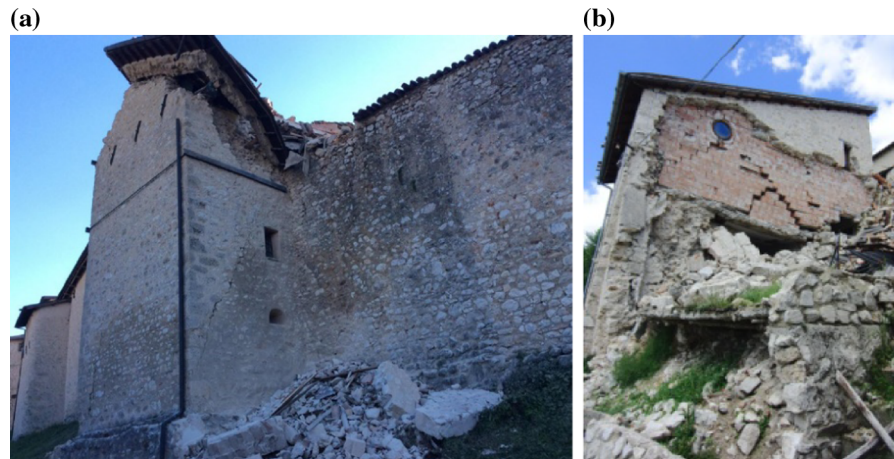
Damage due to irregular interventions on masonry walls: a damage of stone masonry bearing modern r.c. roof; b collapse of stone masonry bearing new floor made with modern technique and detachment of external leaf in composite walls
